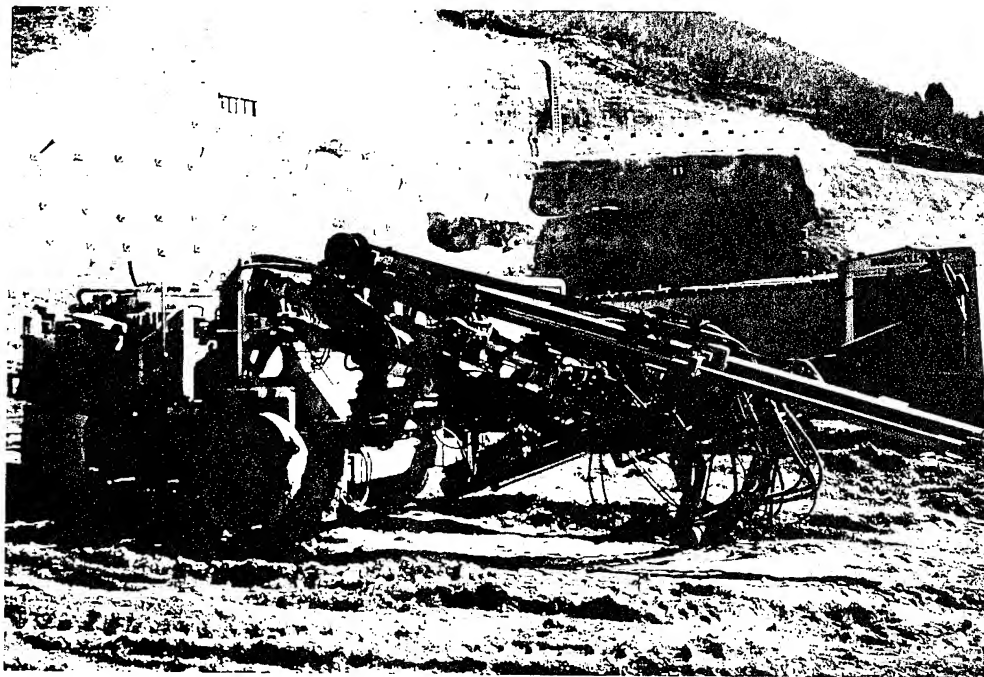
Two-boom drill jumbo parked at downstream portal.
